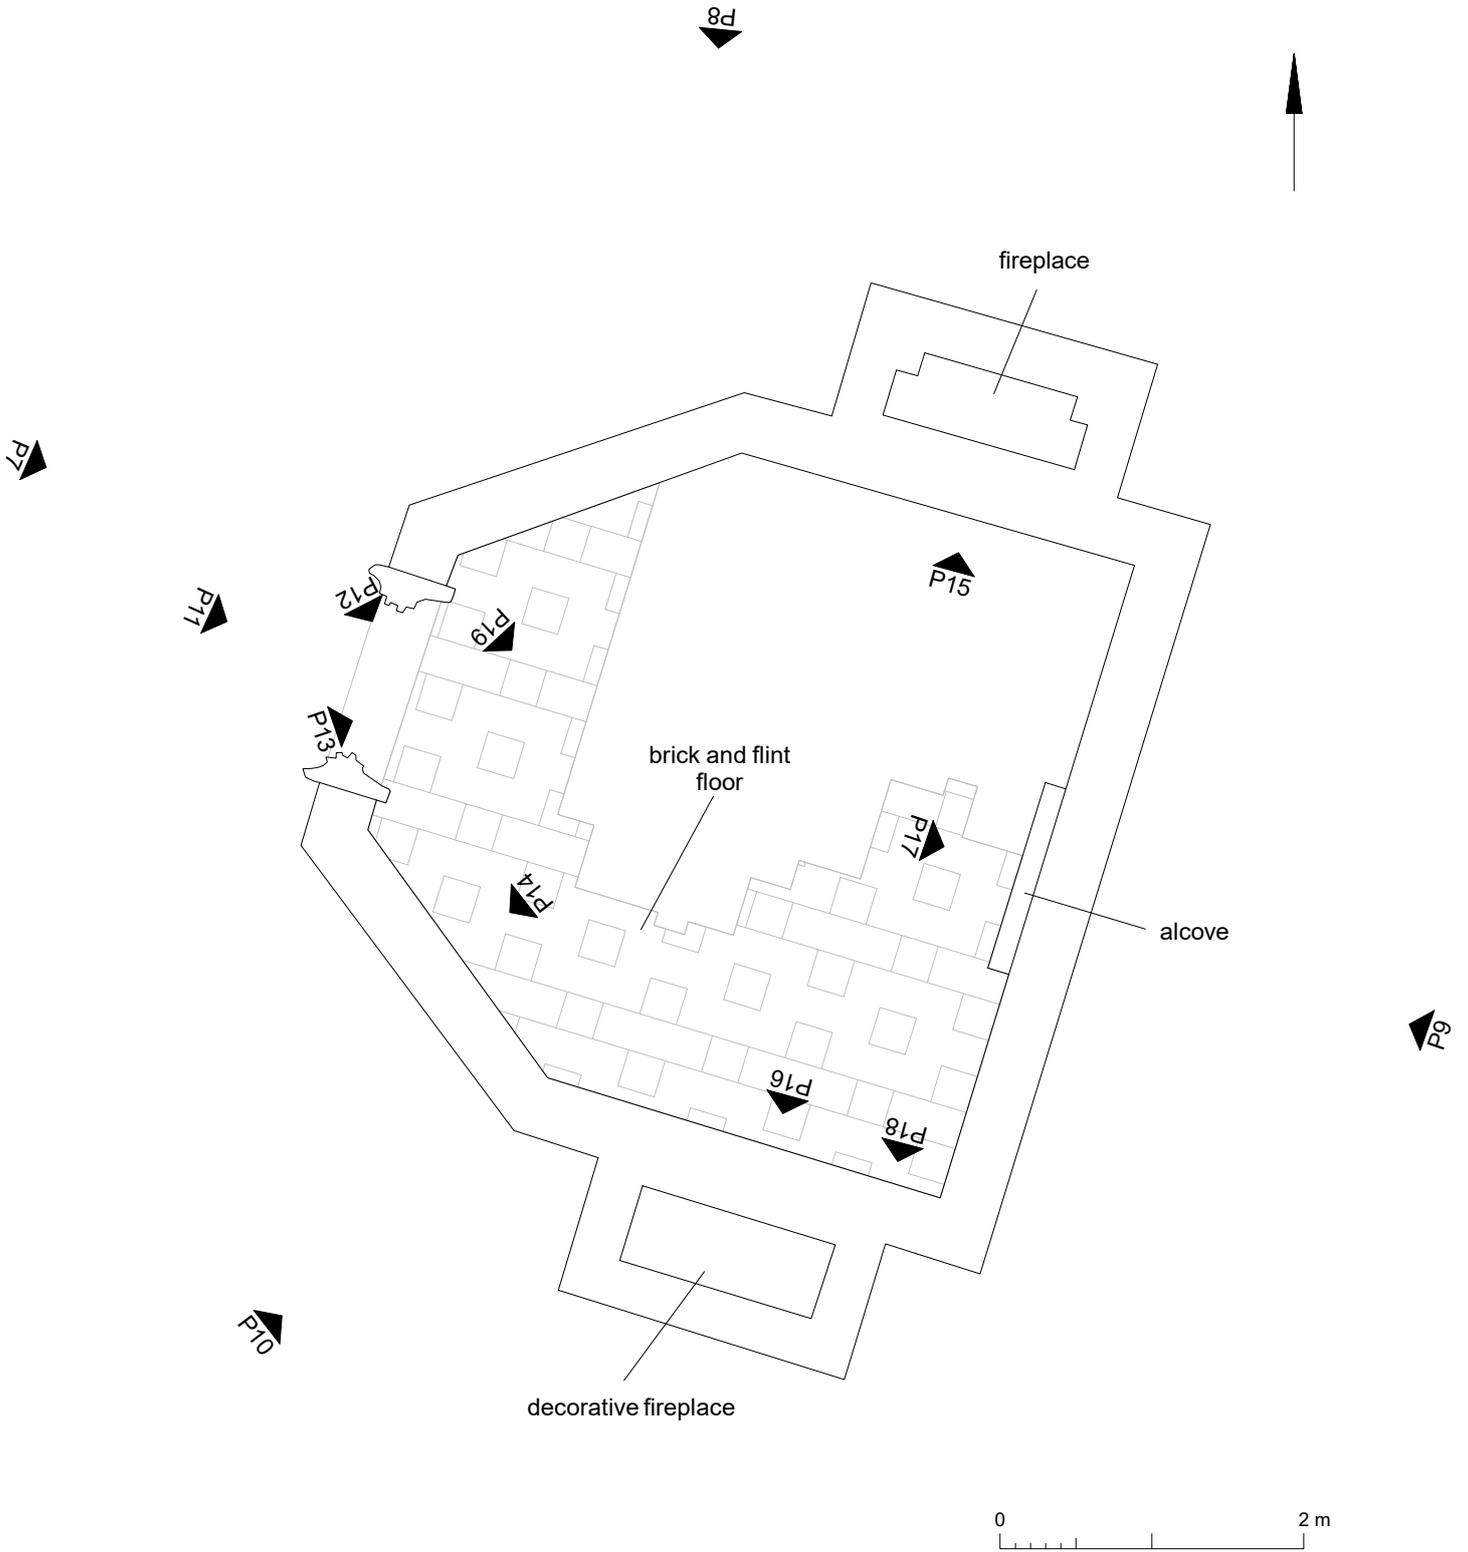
Floor plan. Location and direction of photographs reproduced in the text shown.
